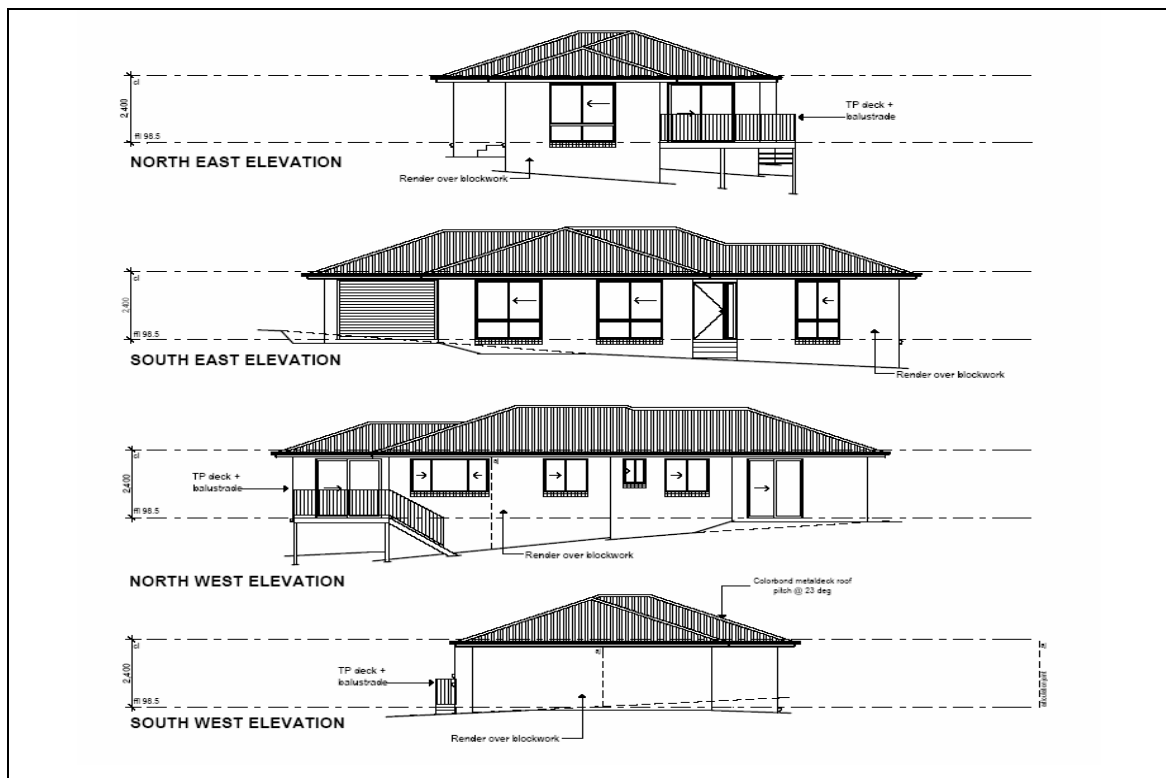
Elevations drawings of the test houses and placement of windows and sliding doors (Source: Wilson Houses)
